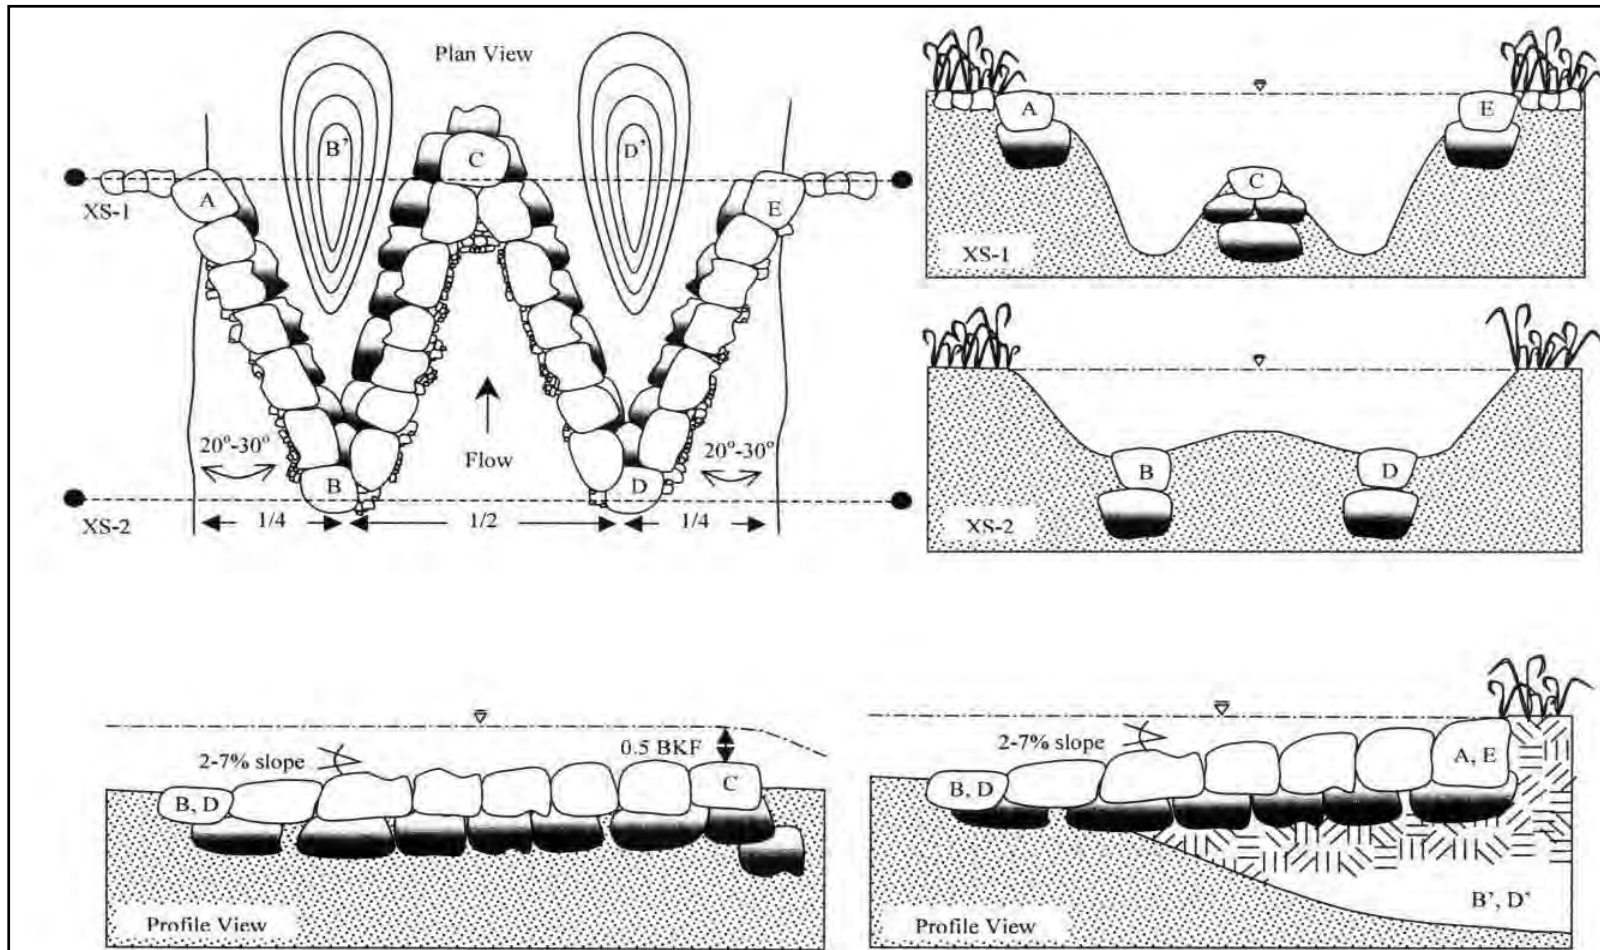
Plan, Cross Section, and Profile Views of the W-Weir (Rosgen, 2001)
